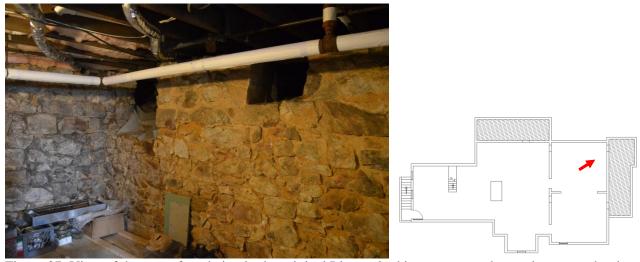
View of the stone foundation in the original I-house looking east towards crawl space under the front gable addition.
